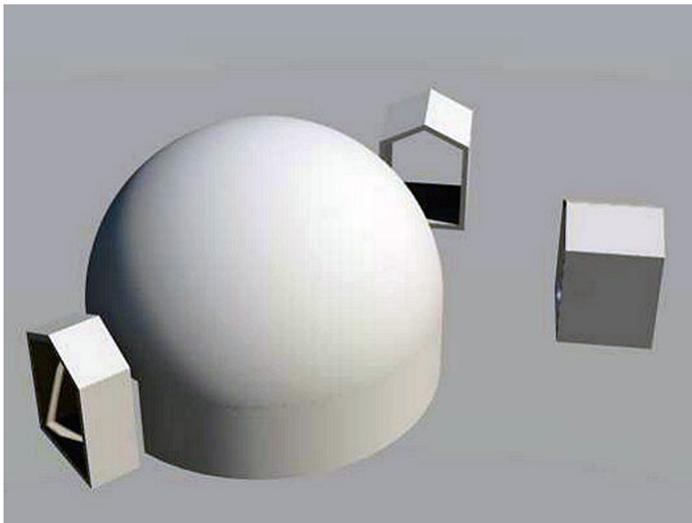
Possible layout of additional prefabricated components and their connection to dome house.
